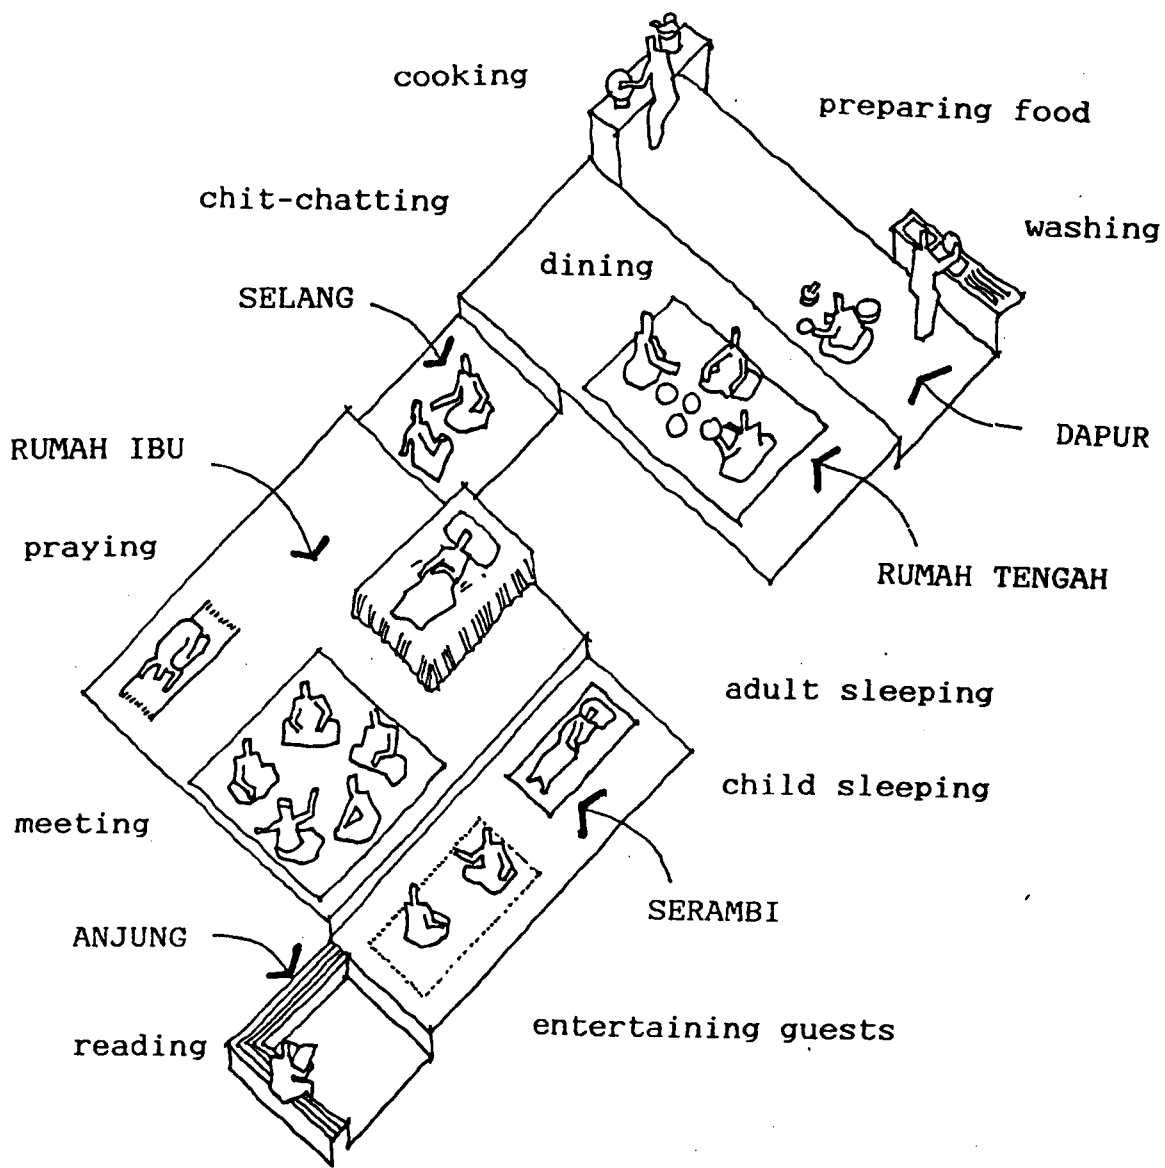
The interior layout of a traditional Malay house.⁹³
